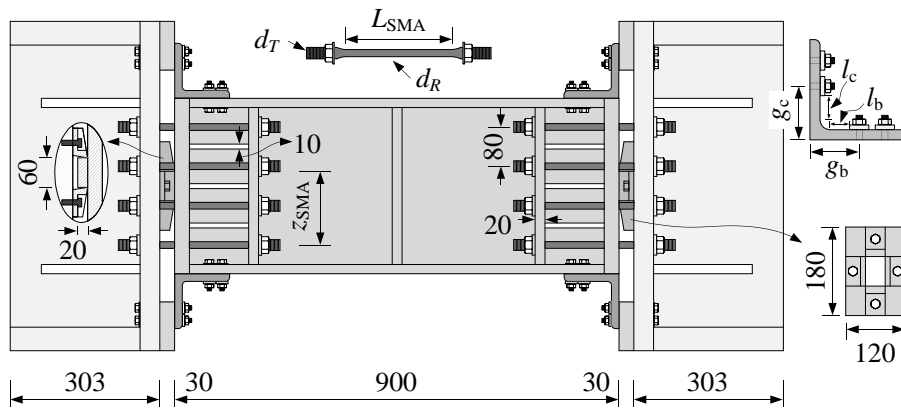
Structural details of the SC steel coupling beam (unit: mm).
